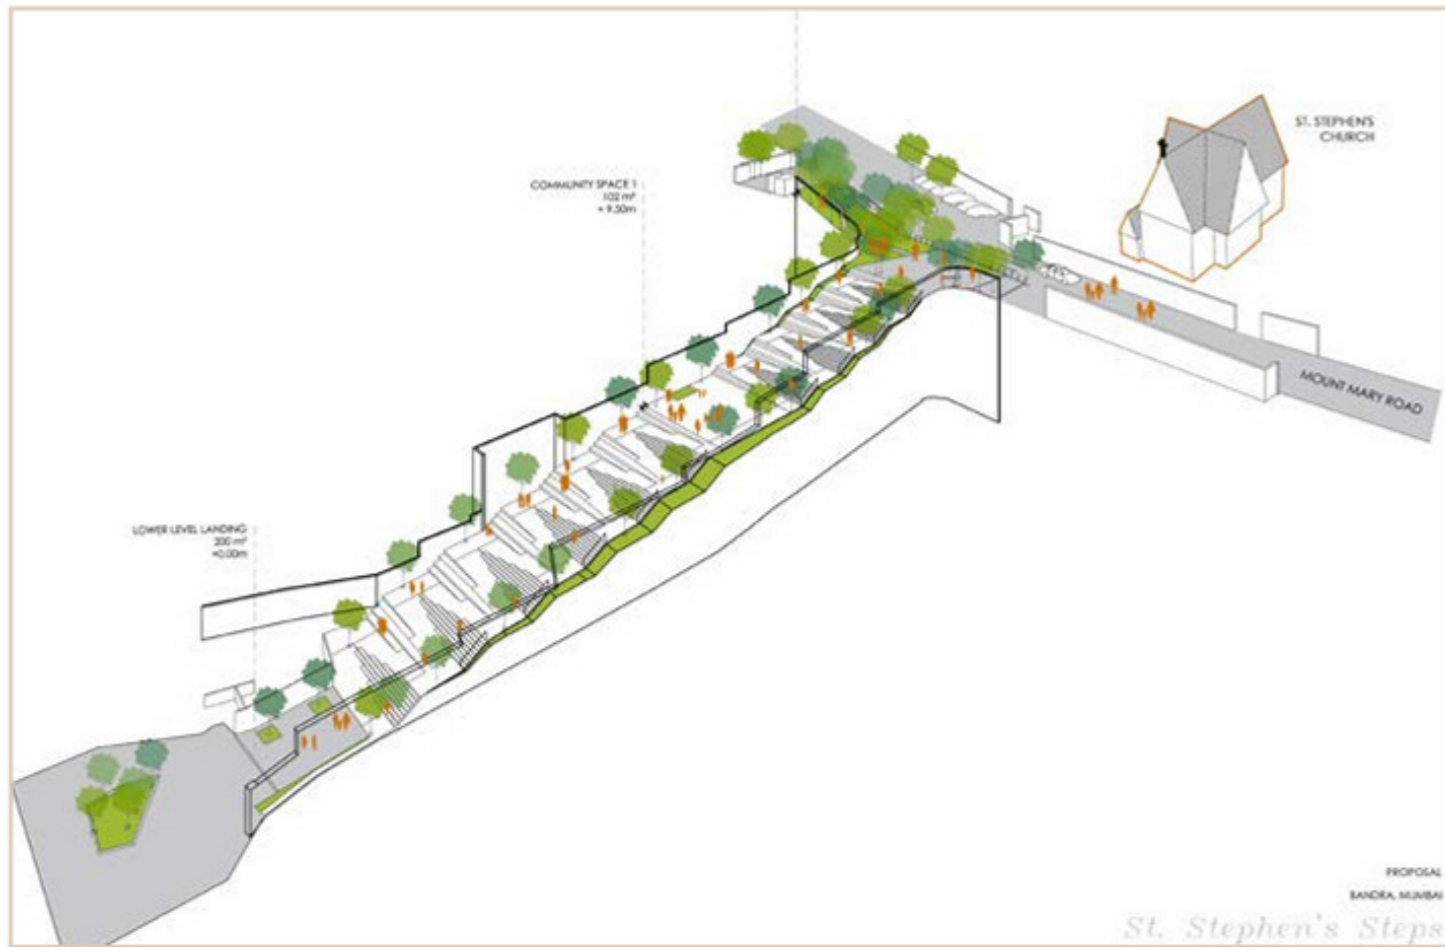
, Redevelopment plan for St. Stephen's Stairs (Nandi & Abraham, 2020)
